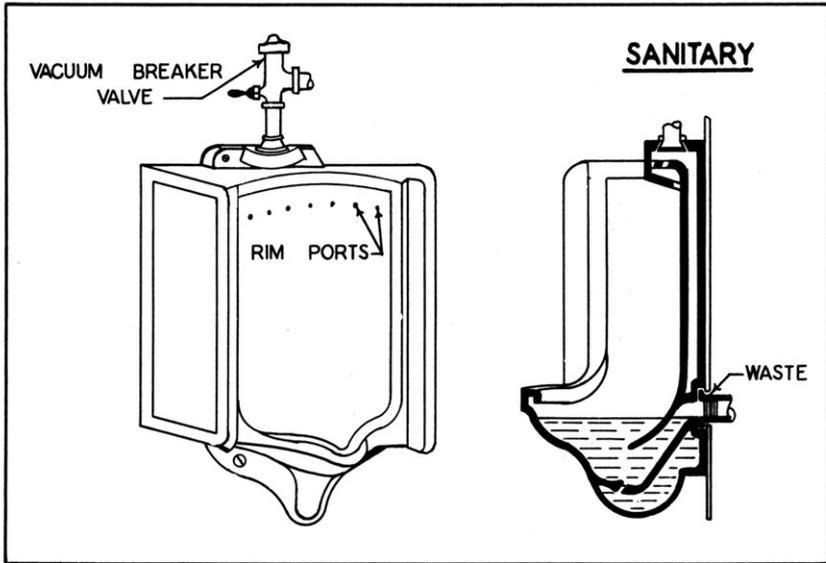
Urinal with vacuum valve. The vacuum breaker valve is necessary to prevent siphonage of the trap contents, because the flow of air through the rim ports is insufficient to break the vacuum which may be produced.
